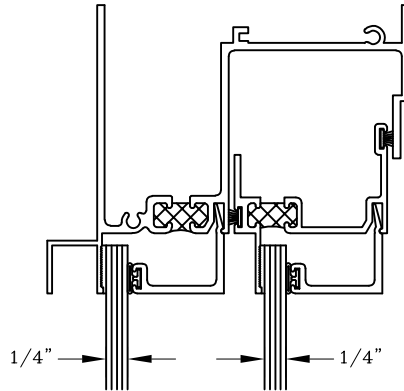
/2 Scale – For Custom Size Drawing Contact Graham
